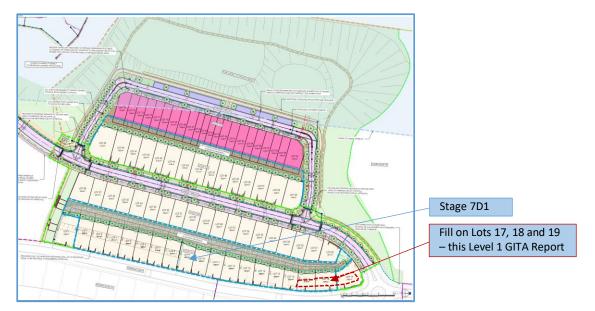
Stage 7D – extract from CJ Arms drawing 'Overall Concept Layout Plan'
